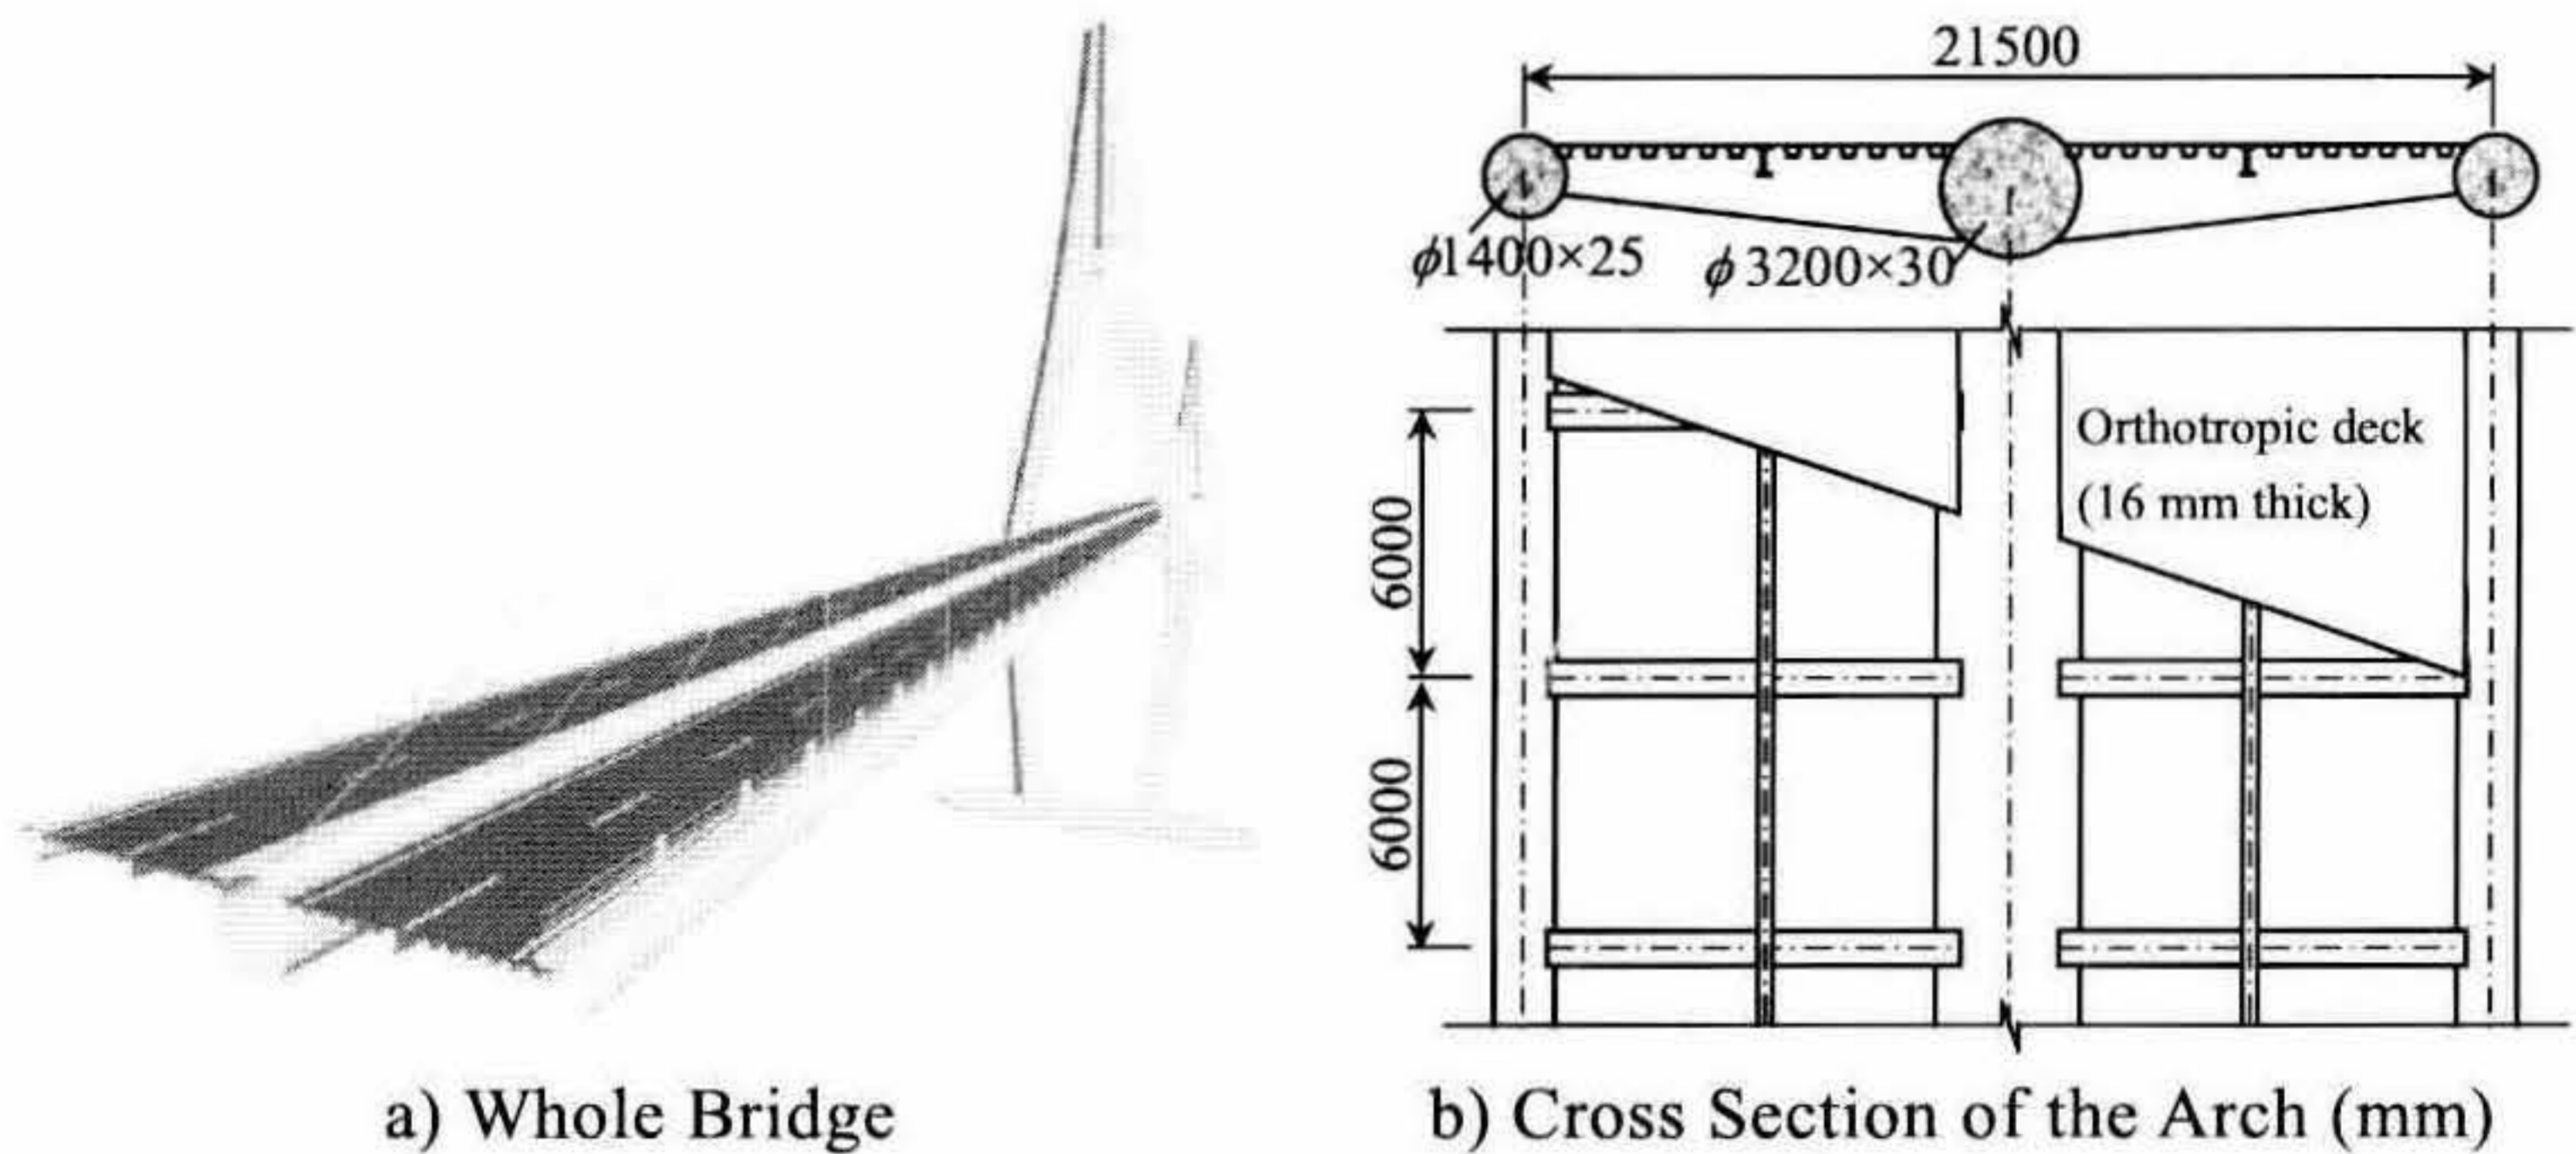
Cable stayed bridge with three pipe girders in the deck (Nakamura 2007)
